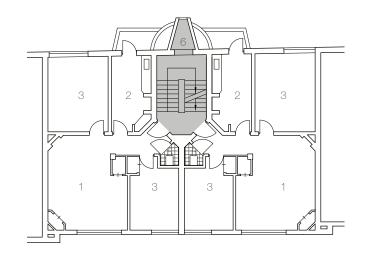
Ground Floor Plan of the shop at the corner and residencial rooms 1:200
